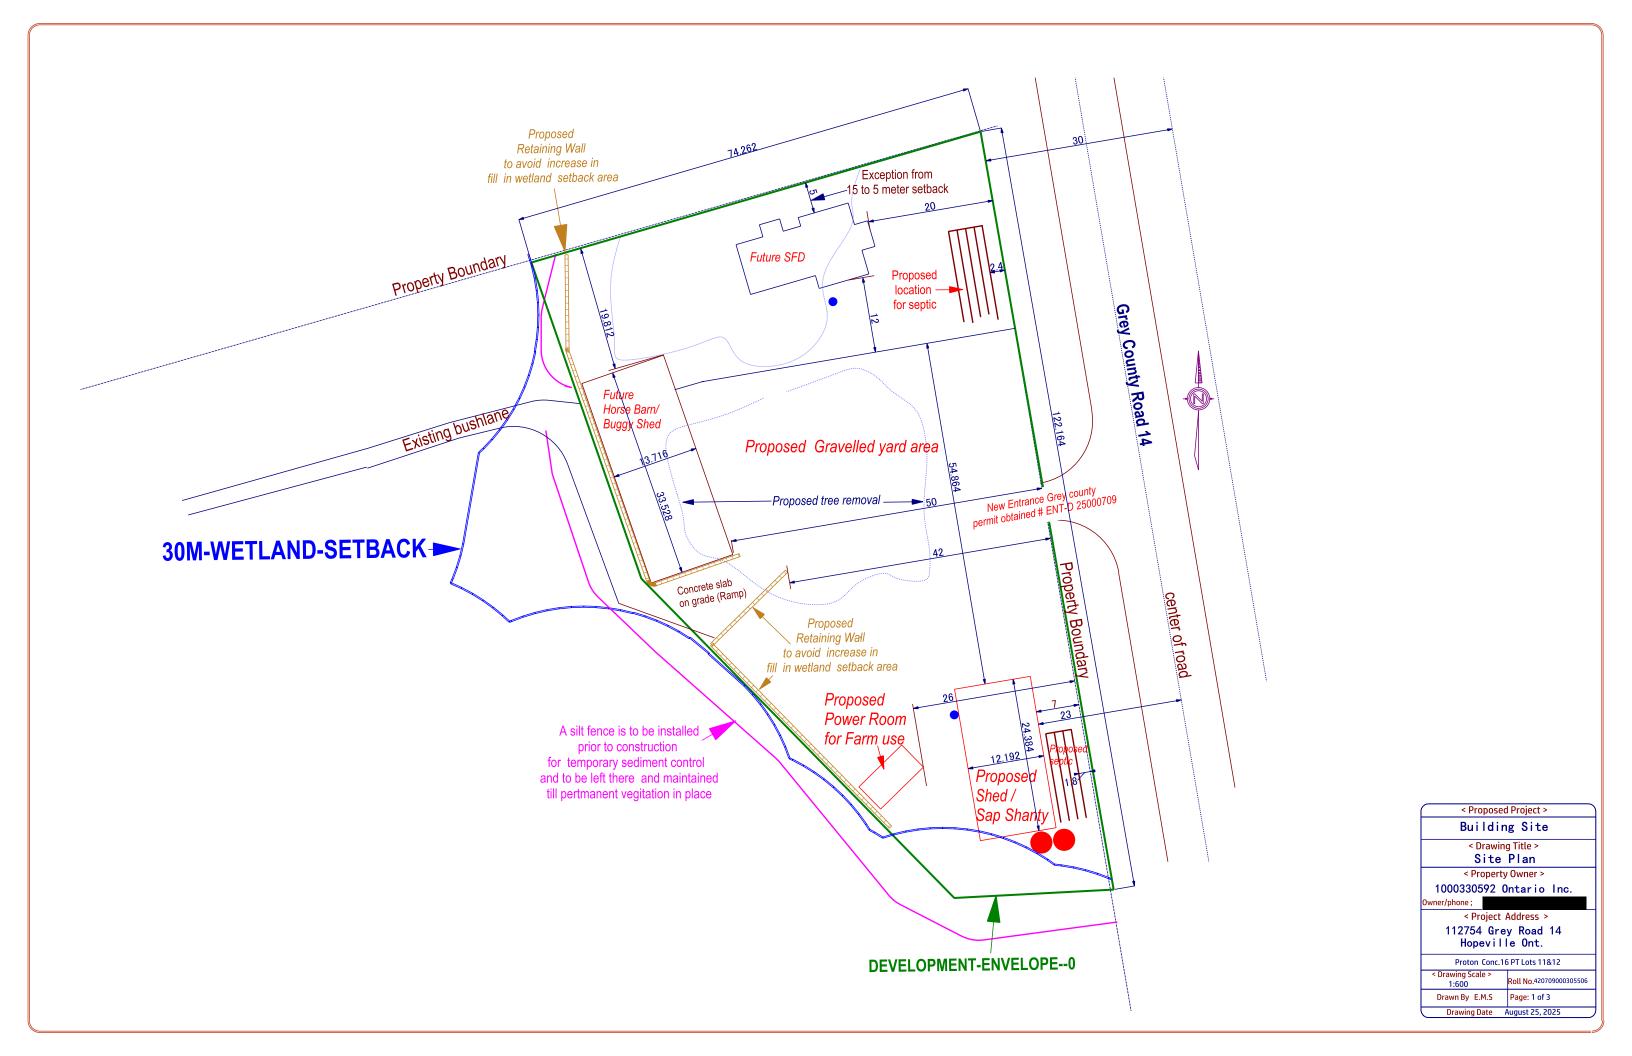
Subject Lands 112754 Grey Road 14 Township of Southgate
